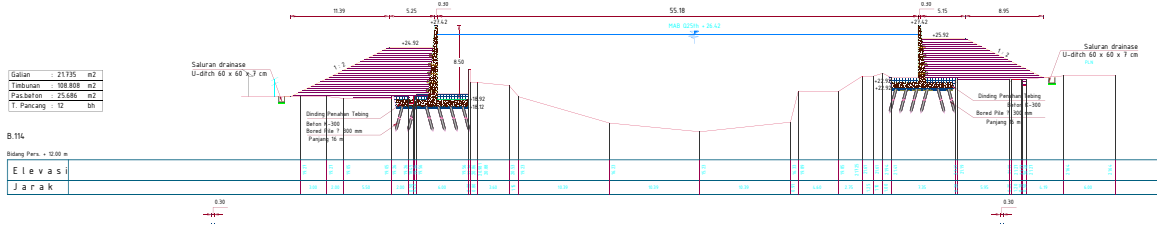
Typical Cross Section of the Bekasi River Upstream Section
